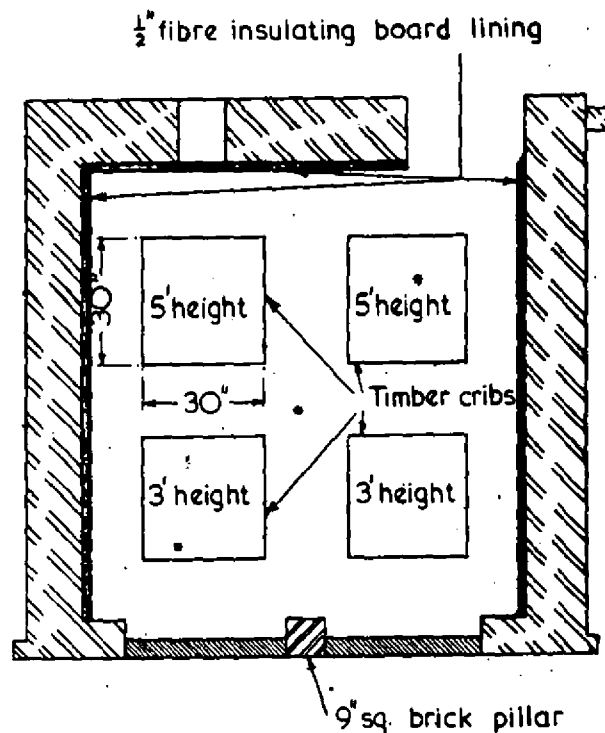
ARRANGEMENT OF FURNITURE AND THERMOCOUPLES IN FIRST FLOOR ROOM
